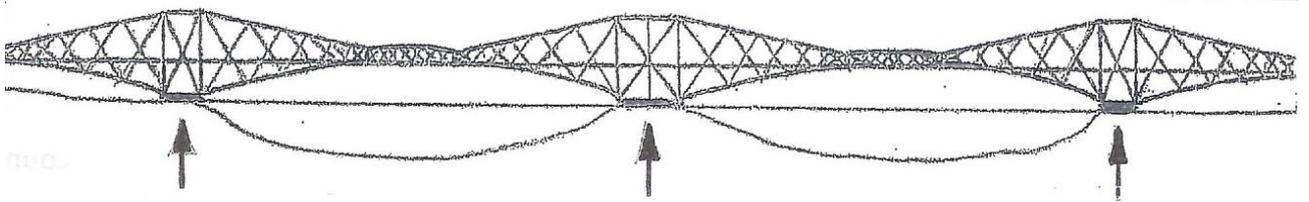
The masonry tower at each end of the Cantilever Section of the bridge would NOT take any load from the adjacent Cantilever.
